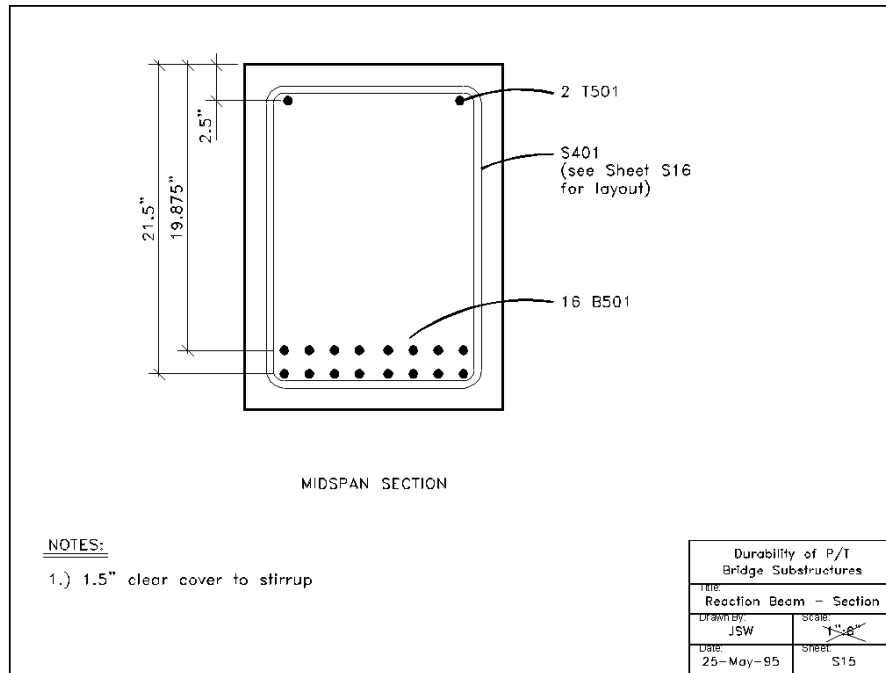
Sheet S15: Reaction Beam Section ^{4.2}
